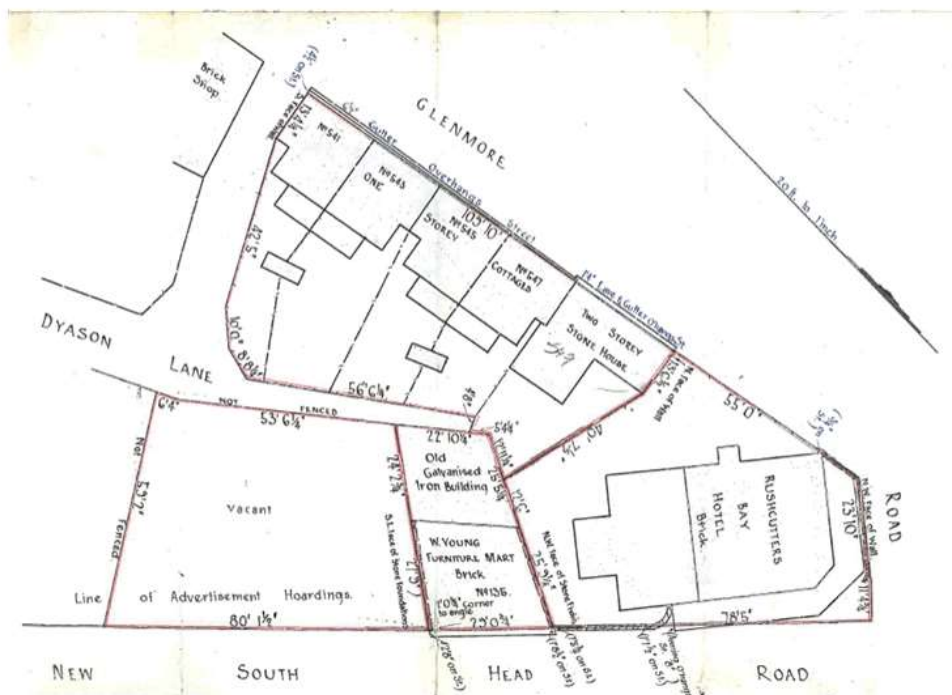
Survey certificate, Rushcutters Bay Hotel 133 New South Head Road, 541-549 Glenmore Road, 18 May 1955, showing the 8" encroachment over the New South Head Road road reserve. (Source: Anglican Archdiocese of Sydney)
